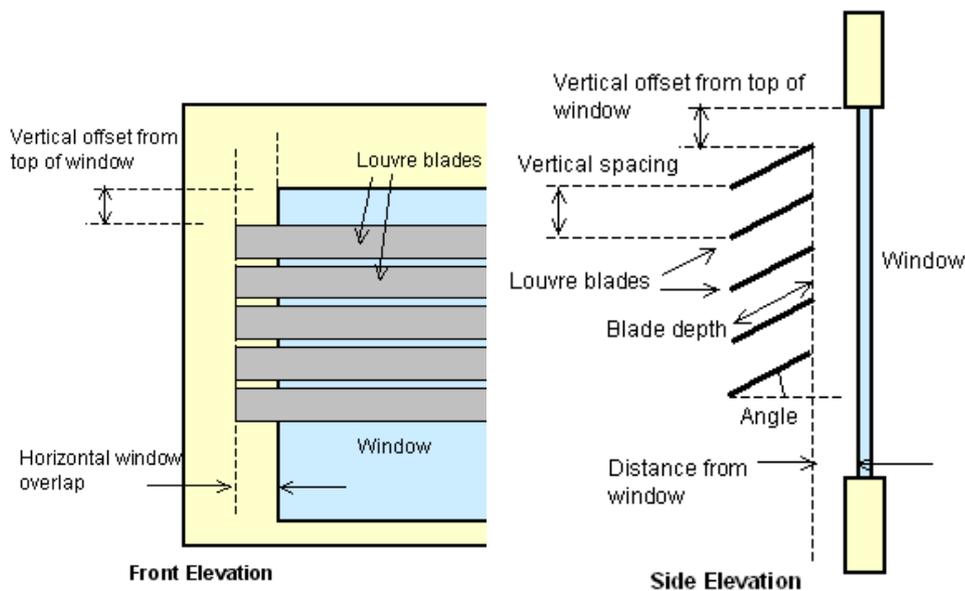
a) Louvre shading front elevation. b) Louvre shading side elevation
